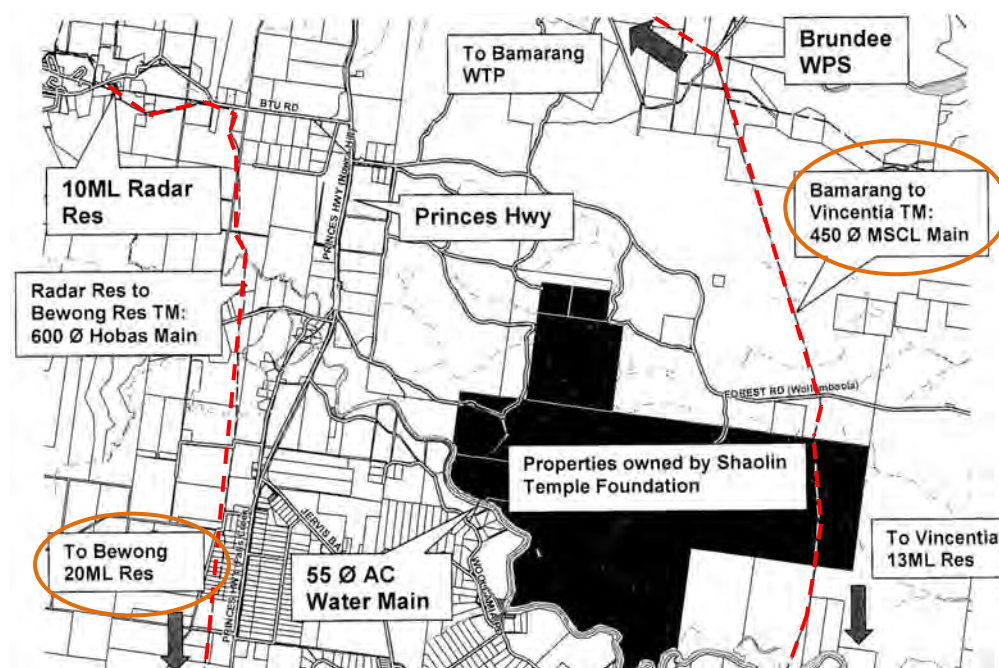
Existing water supply infrastructure (source: Shoalhaven Water)
